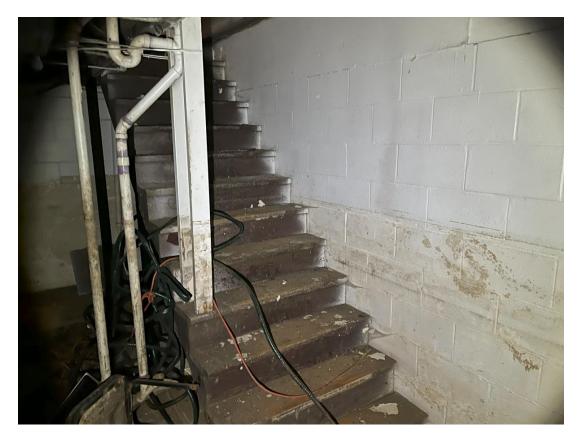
Appears that the basement has filled with water to approximately 4 feet
